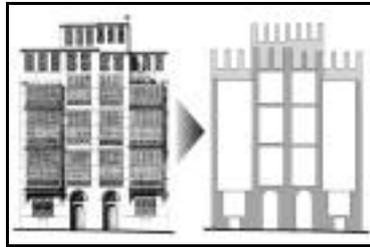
Step 1 for modeling: Constructing the 3D masses of the building
